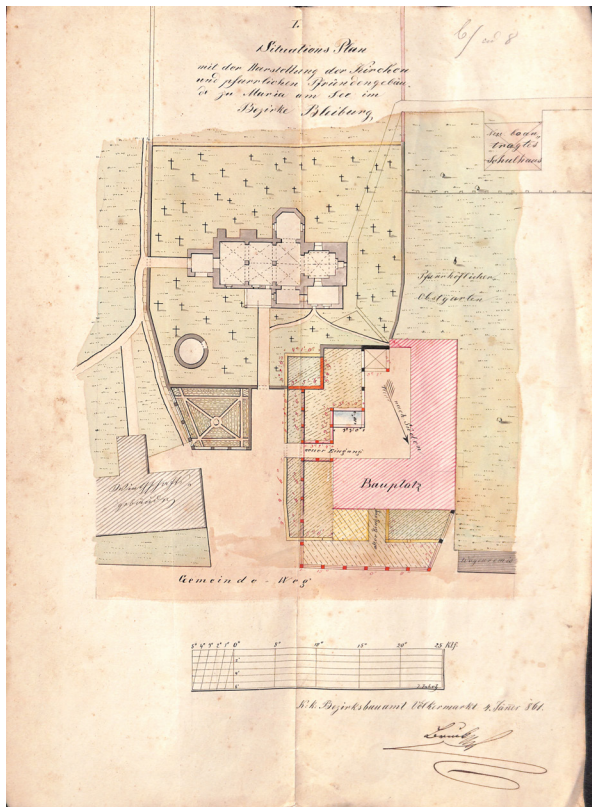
Site plan of parish buildings in Prevalje, author: Bruck, 4. 1. 1861
